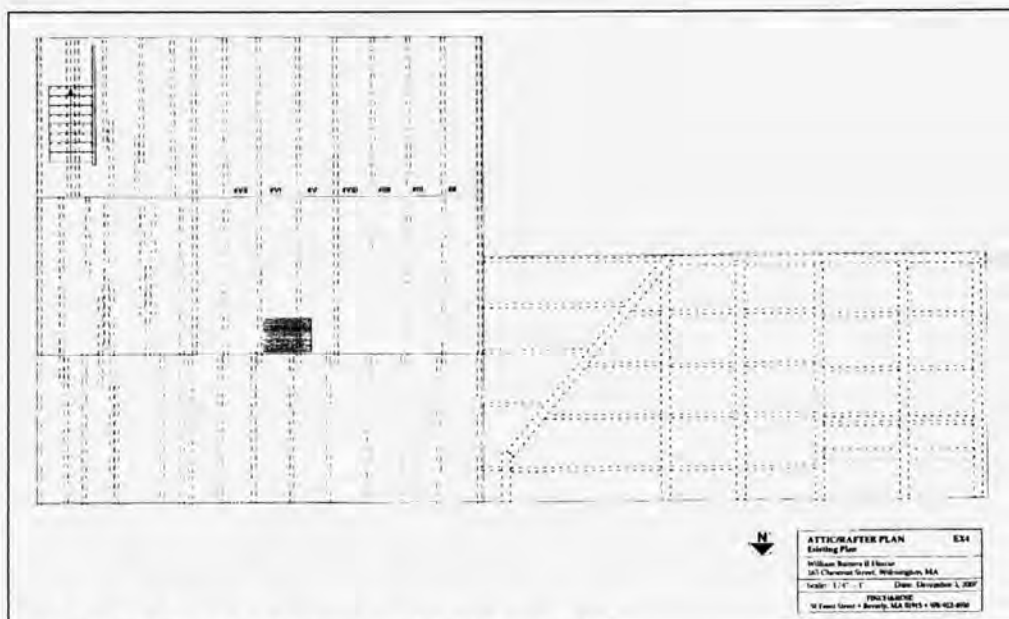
Plan of Rafters, Drawing by Finch & Rose, 2007.
